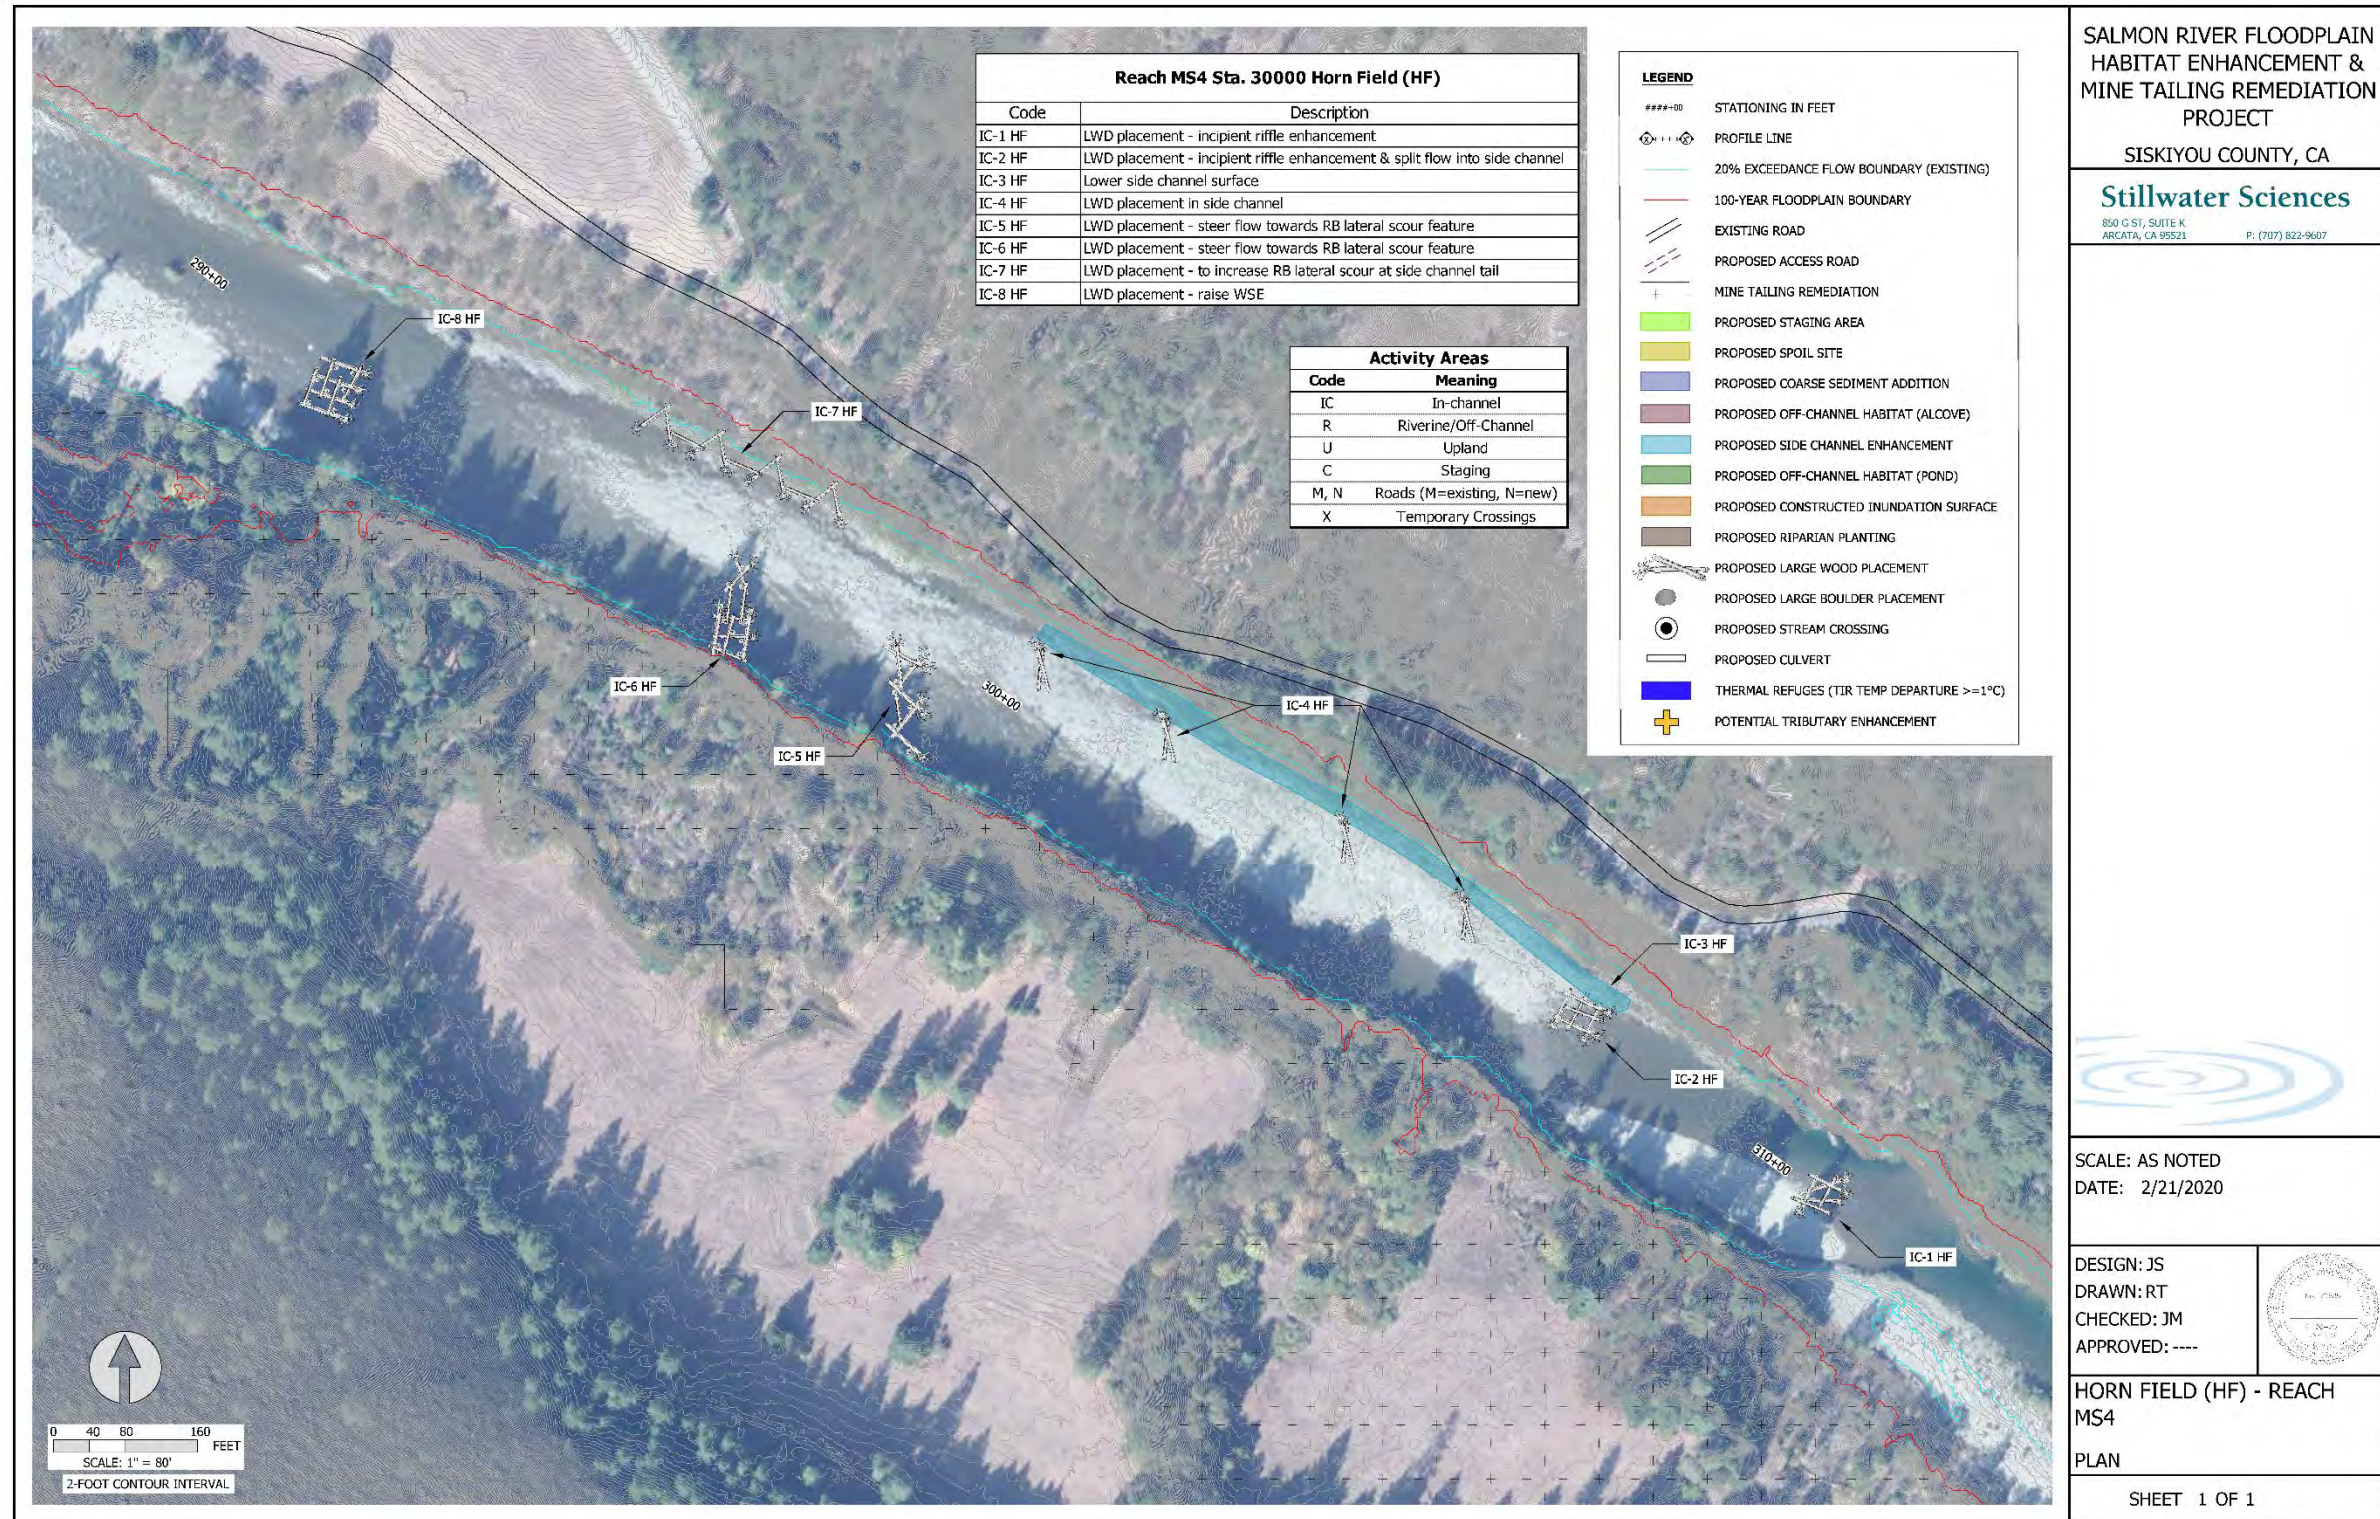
Design plan for Mainstem Reach 4 at Horn Field.
